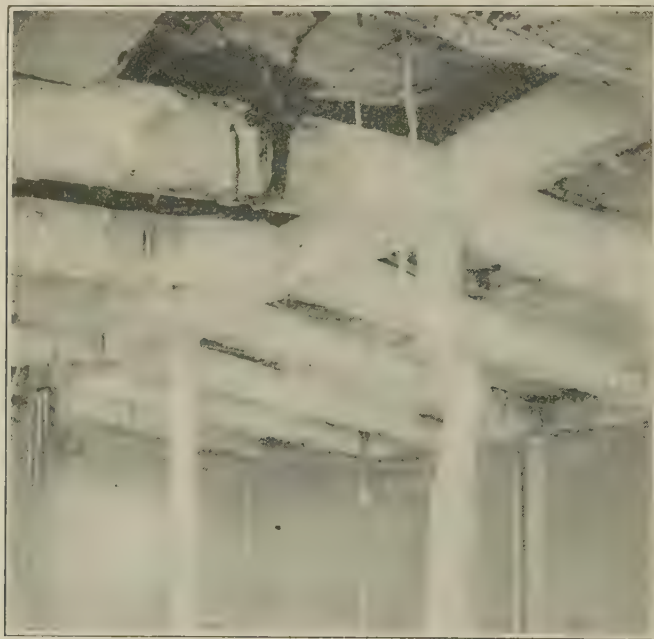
TYPICAL FAILURE IN SECOND FLOOR.
